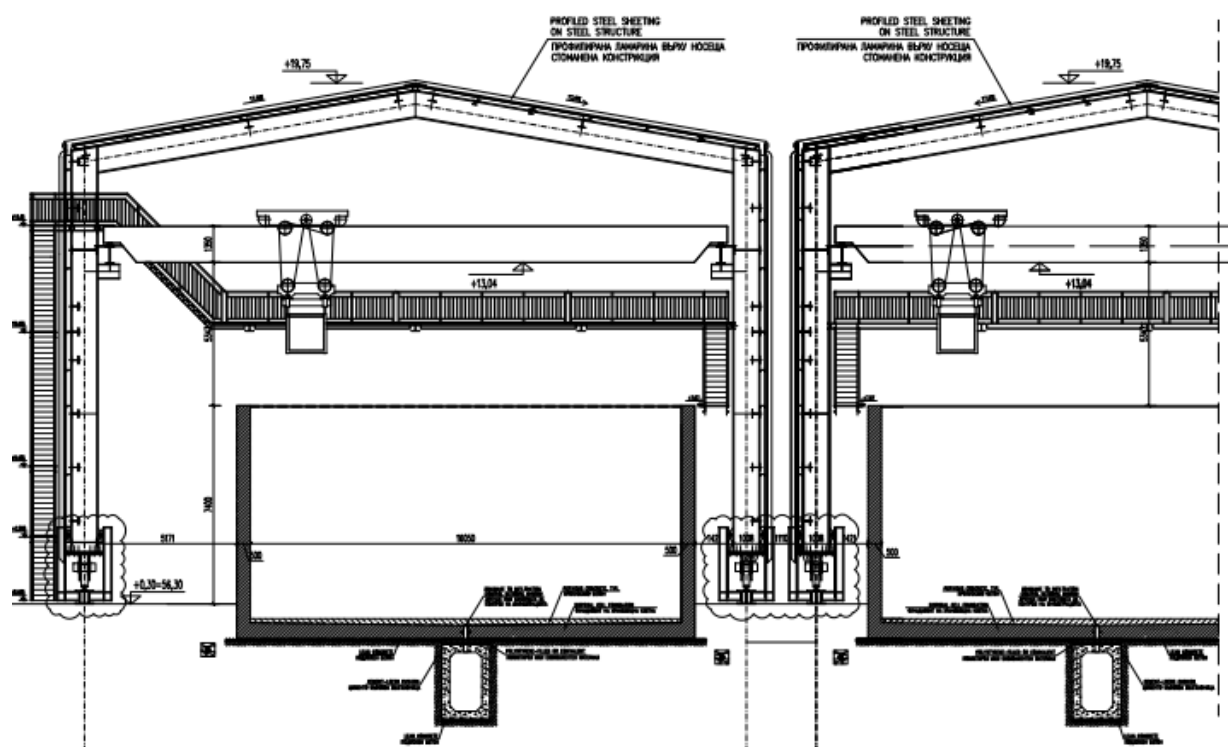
SLIDING PROTECTIVE ROOF - CROSS SECTION
